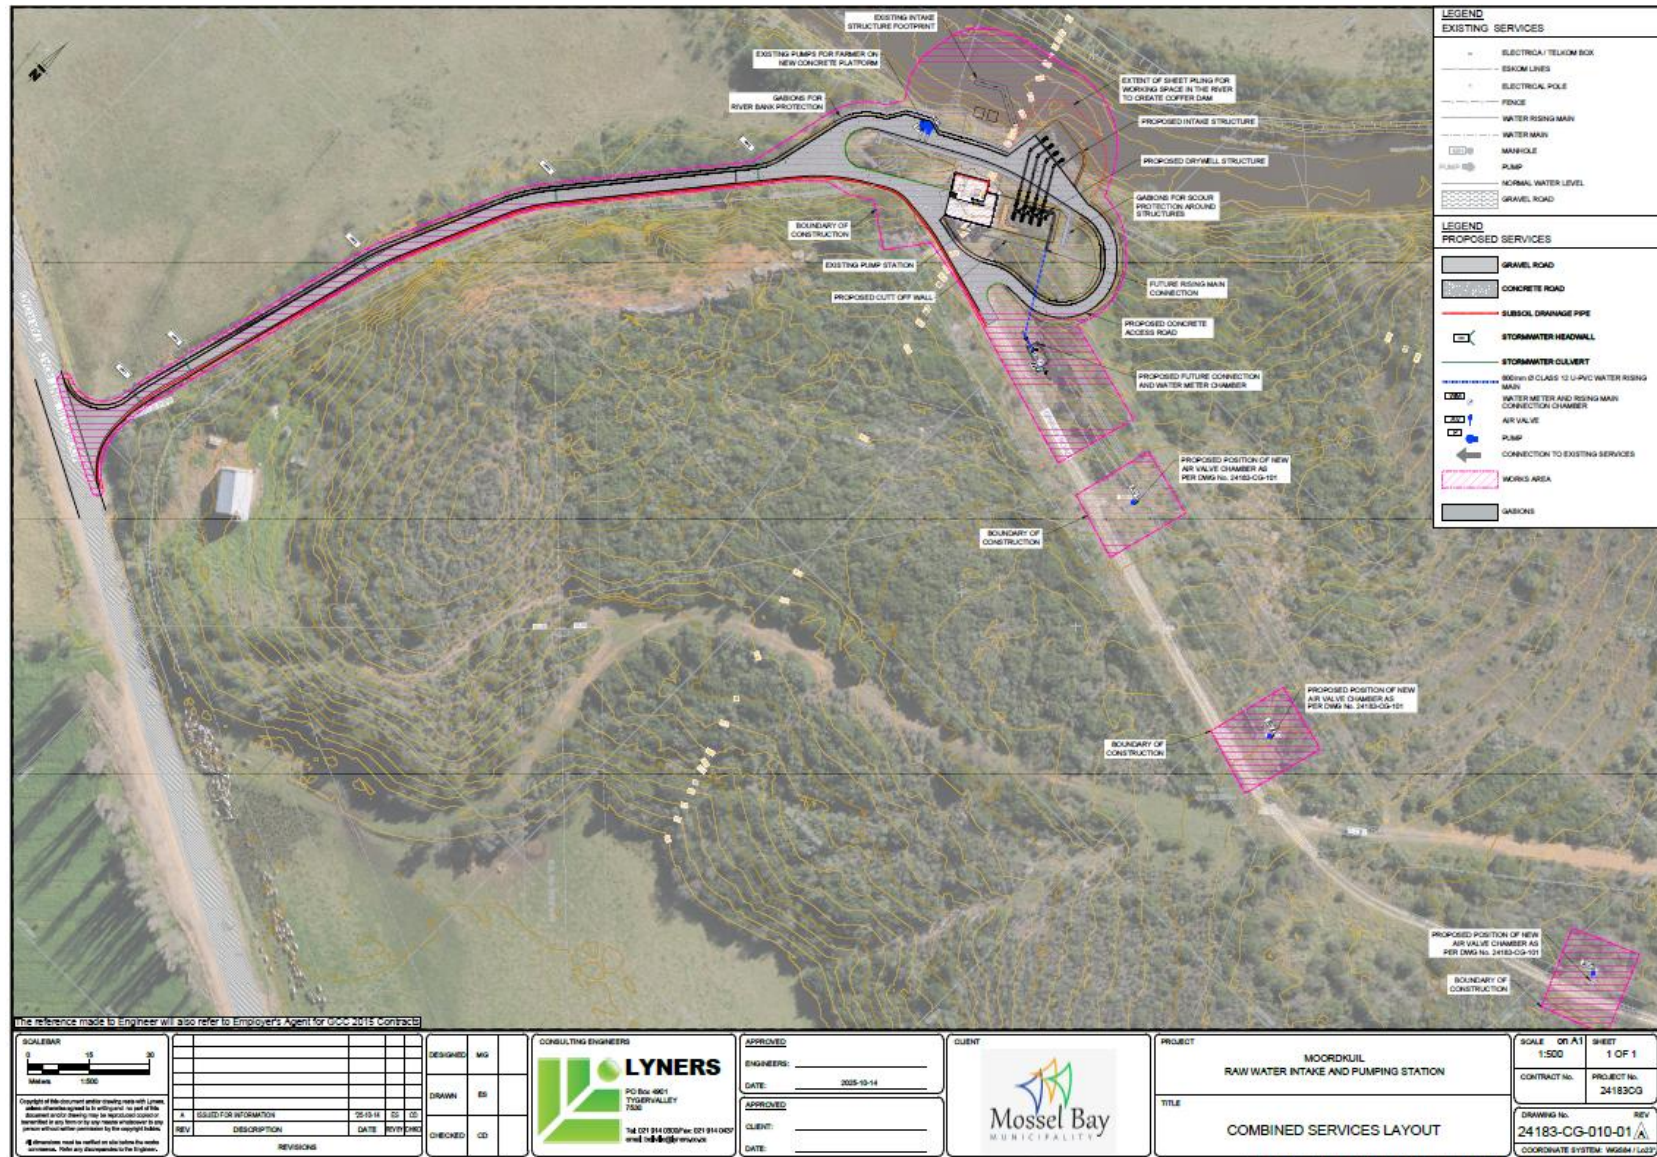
Site Layout Plan showing the combined services and new gabion structure.
